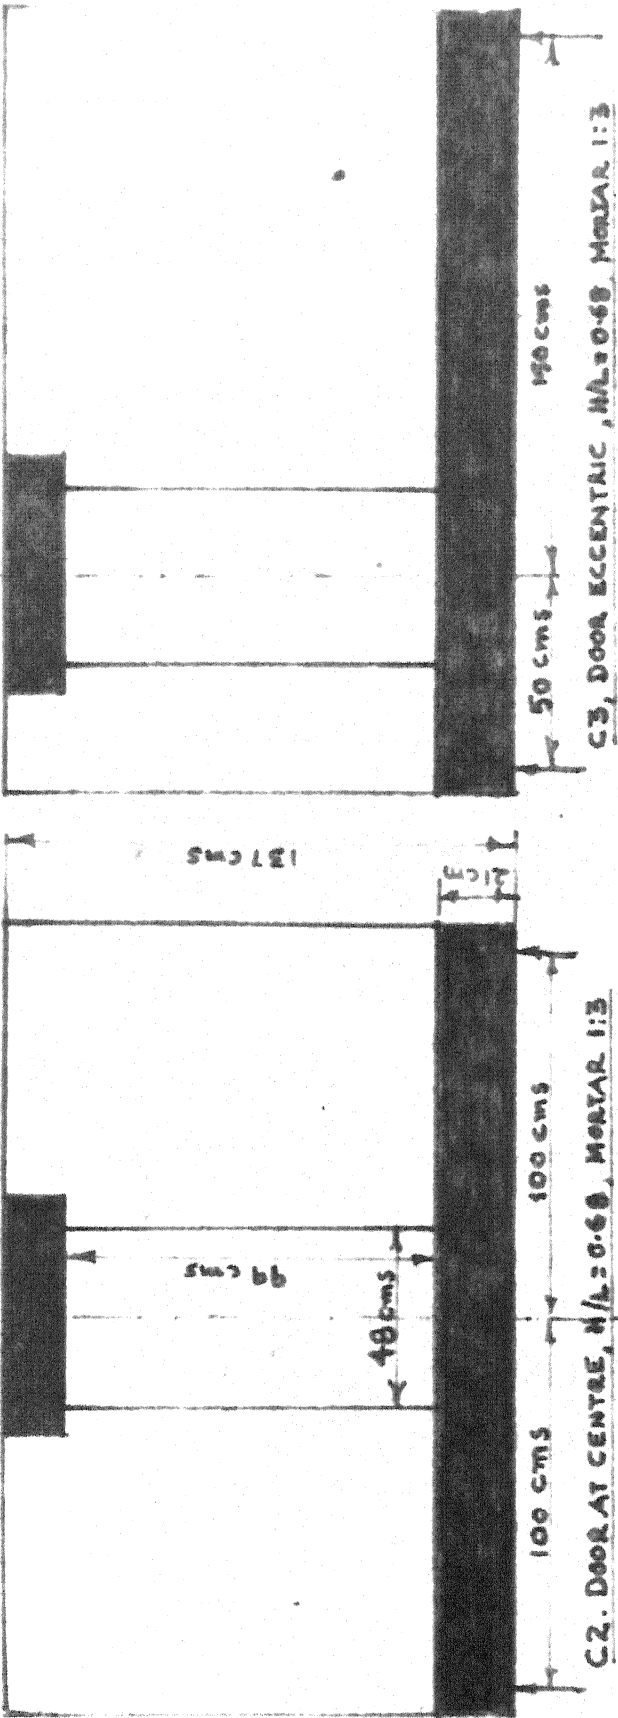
(b). DETAILS OF SPECIMENS WITH OPENINGS UNDER COMPRESSIVE LOADING.
